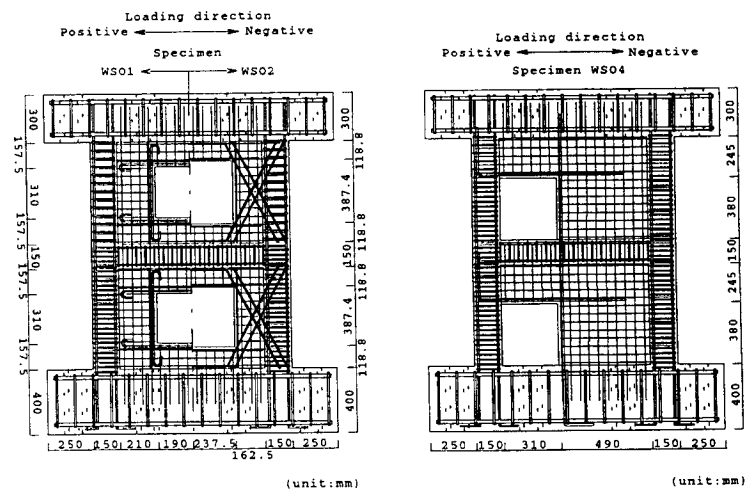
Reinforcement of specimen (WSO1, 2 and 4)
